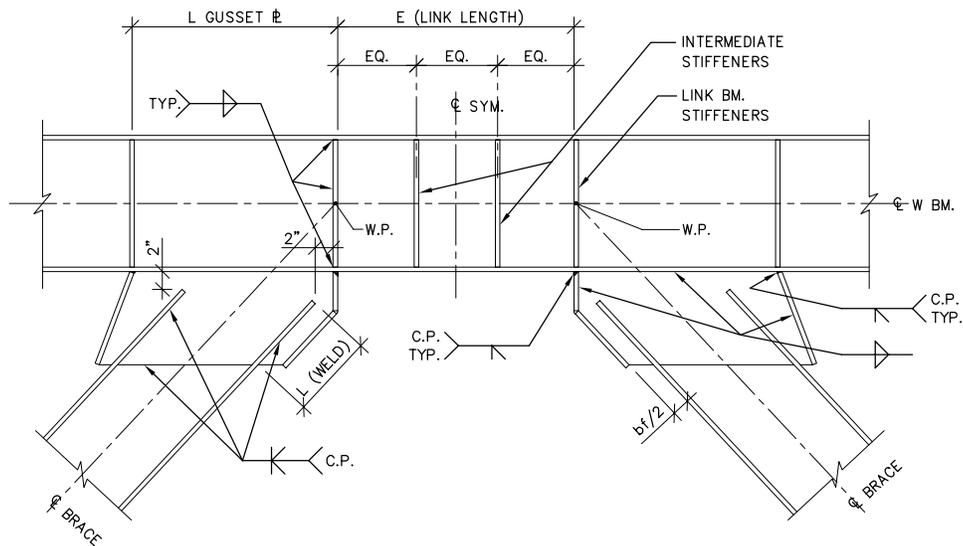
EBF brace-beam connection at link using wide flange brace
